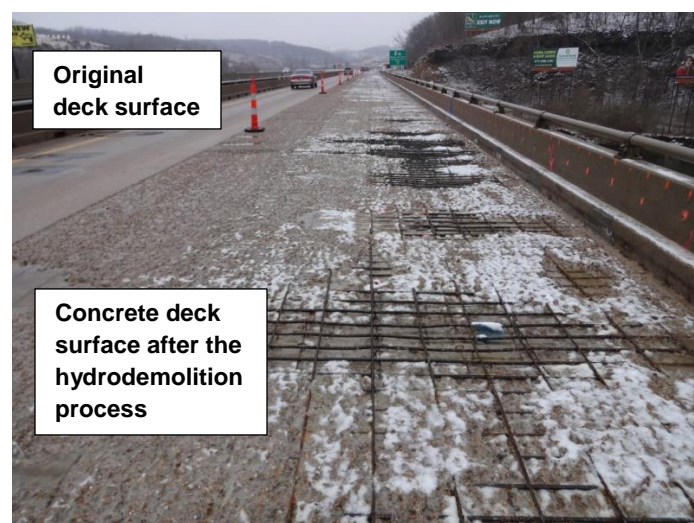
Photo of the bridge deck surface after hydrodemolition process.
